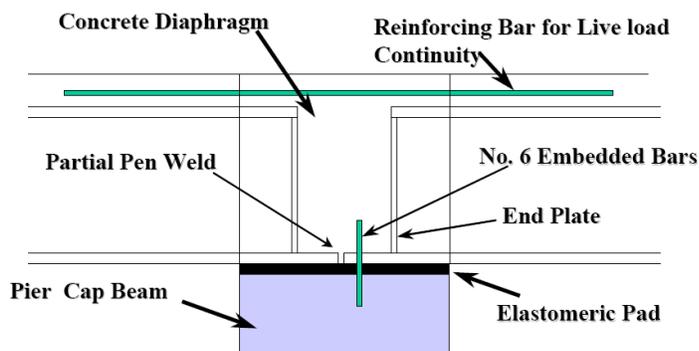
Detail of connection designed by the University of Nebraska [3].
